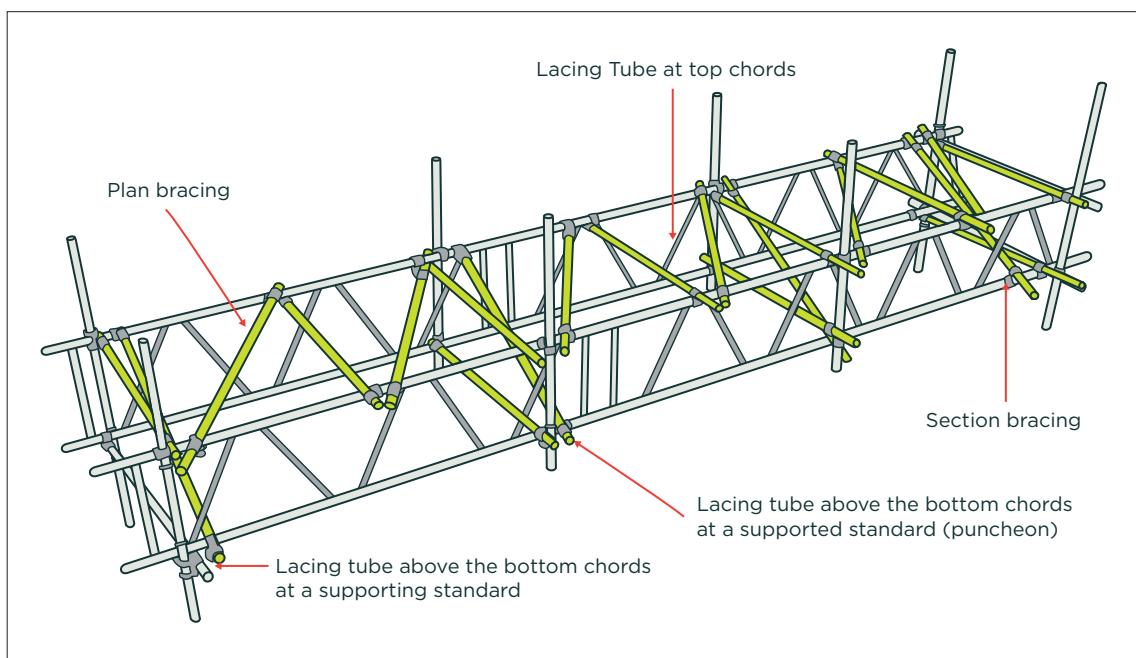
A pair of trusses acting as a bridge between two pairs of supporting standards
